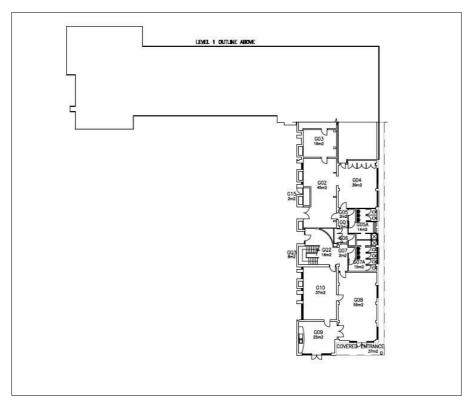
Ground Floor.UNSW Information Services. Plan last modified June 2004.
